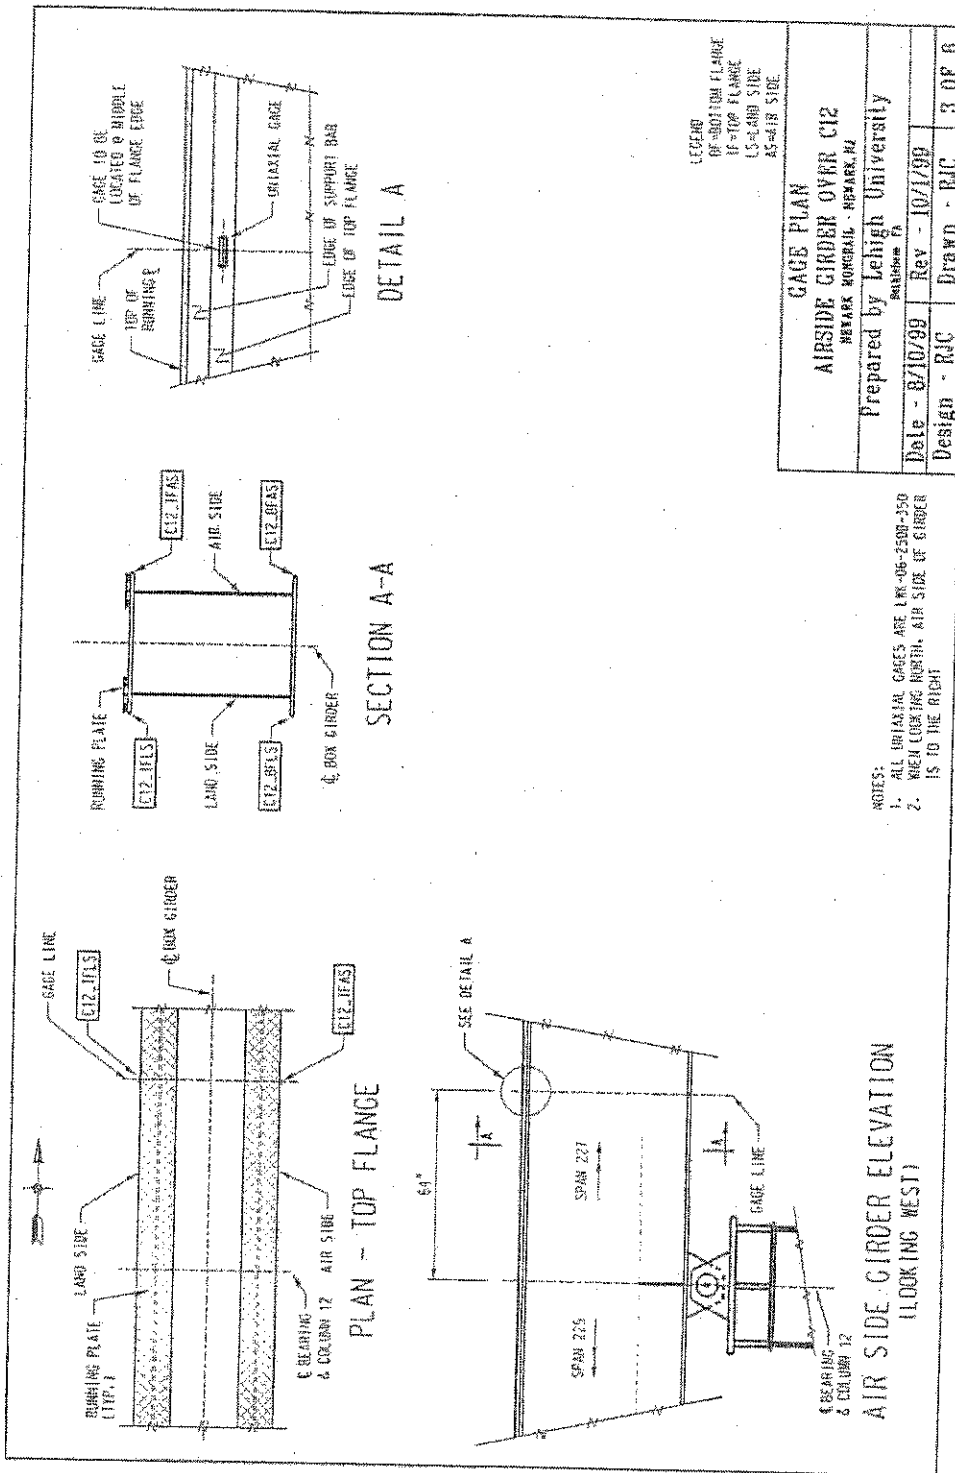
Strain Gage Layout Adjacent to Column 12 – Air Side
